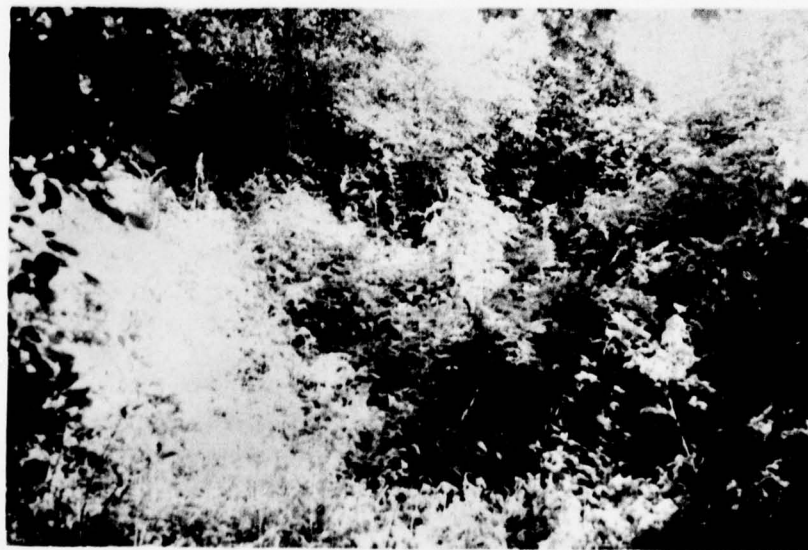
View of downstream slope of dam showing heavy brush and timber growth on embankment.
